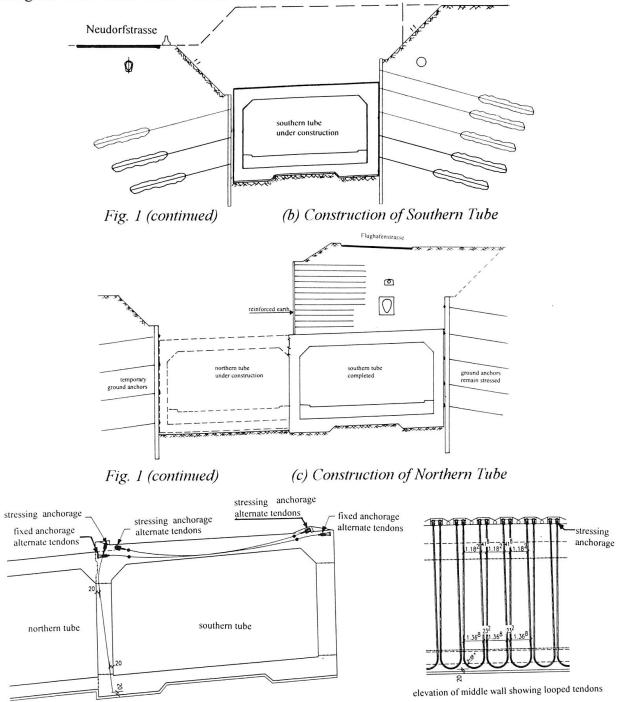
Tunnel 'Flughafenstrasse': Layout of Prestressing Tendons in Typical Cross Section
